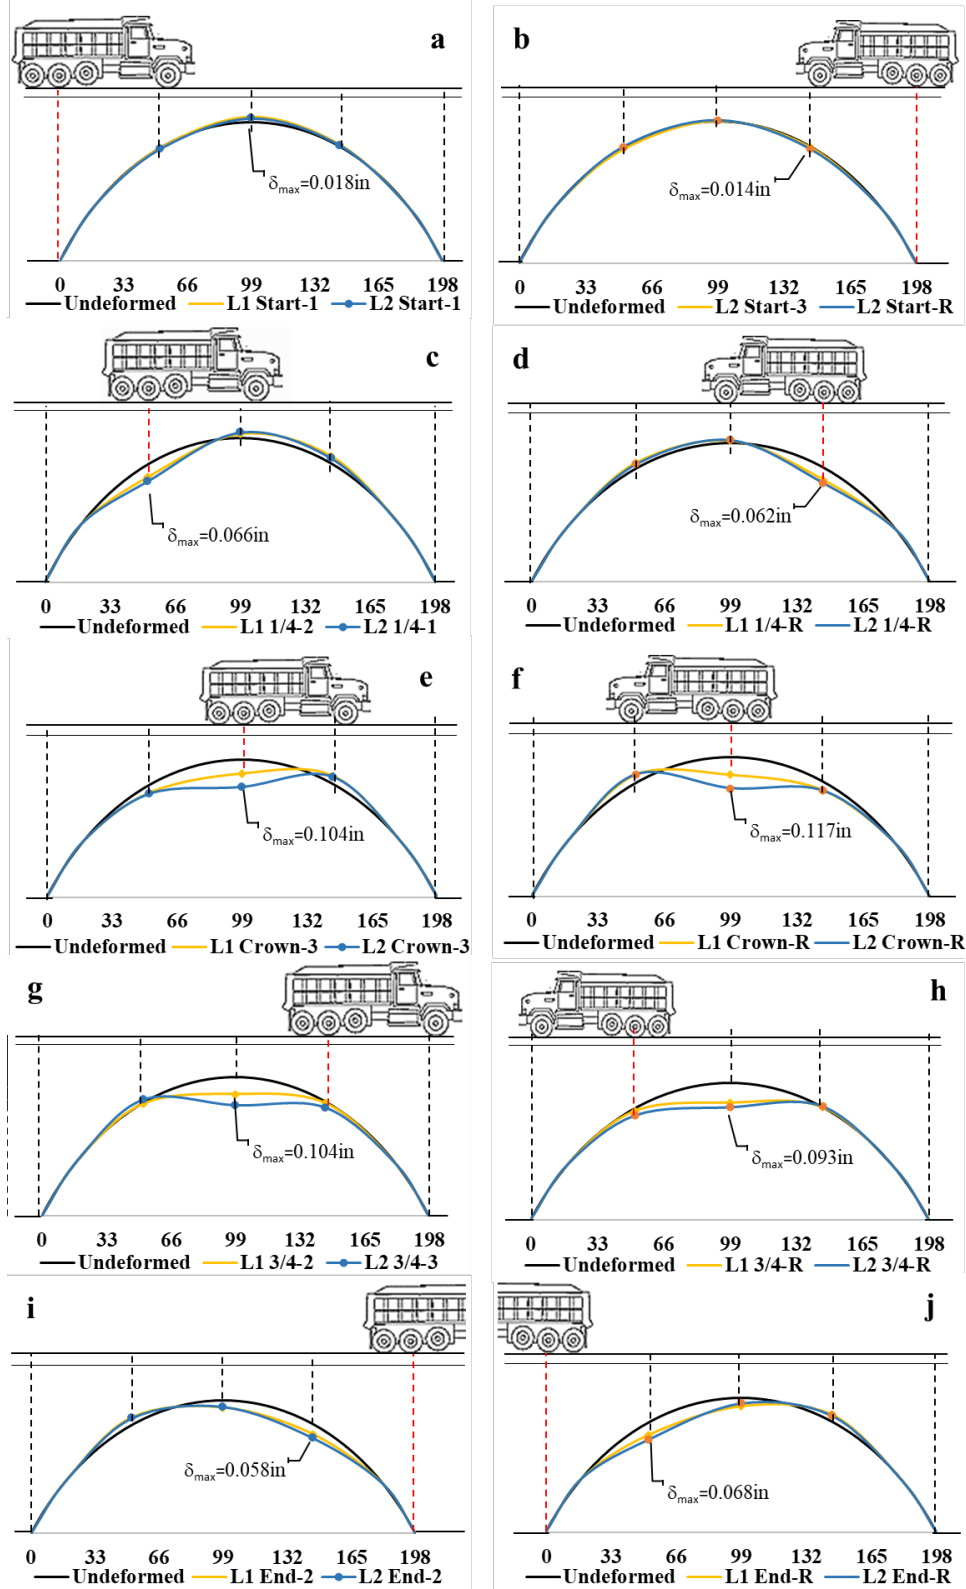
Deformed shapes of the Berman Road culvert for each load truck position (scale x100).
